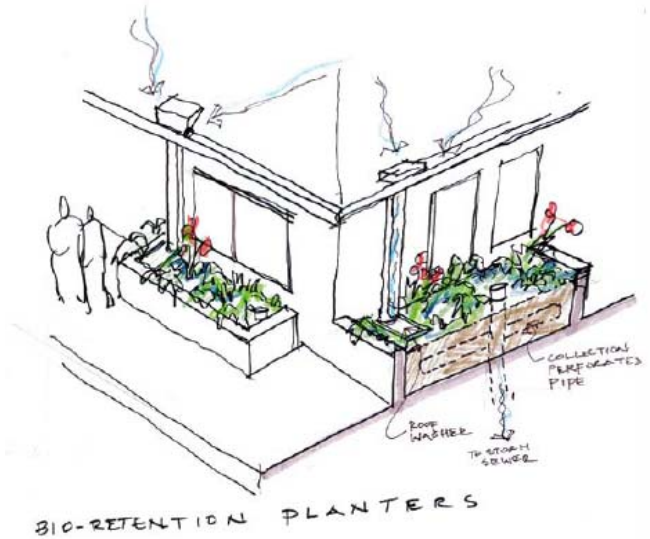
Bioretention planters, above, capture stormwater runoff, improve pedestrian safety, and create a more interesting streetscape.
